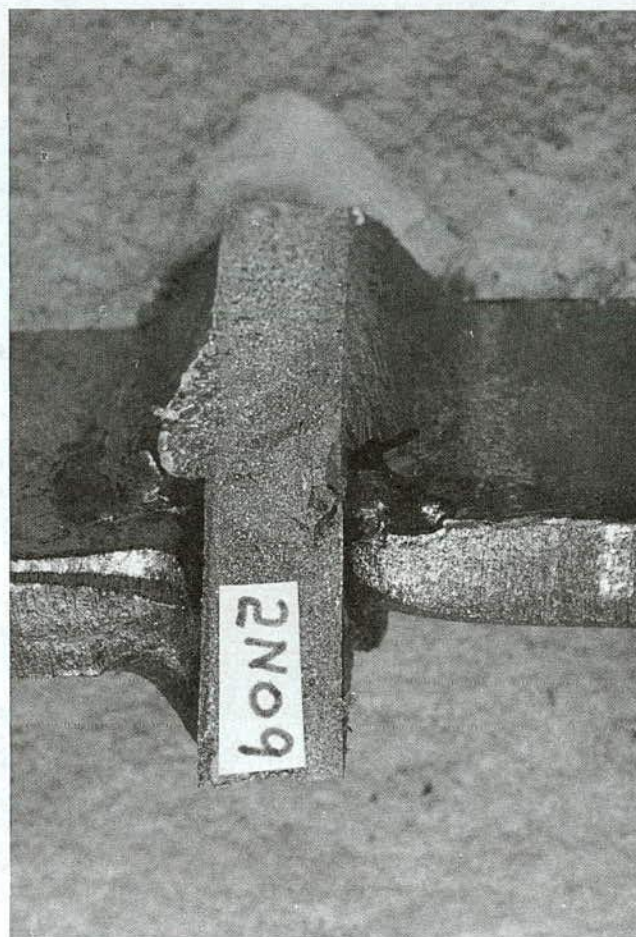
Small crack in Girder 2N web after distortion-induced stresses.
